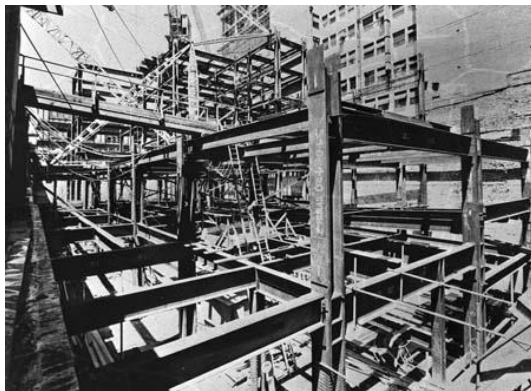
View of the steel framed construction of the Reserve Bank of Australia Head office building, c1962. Source: National Archives of Australia.
